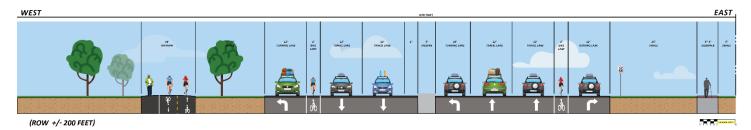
Proposed Typical Section, SR-5/Federal Hwy
